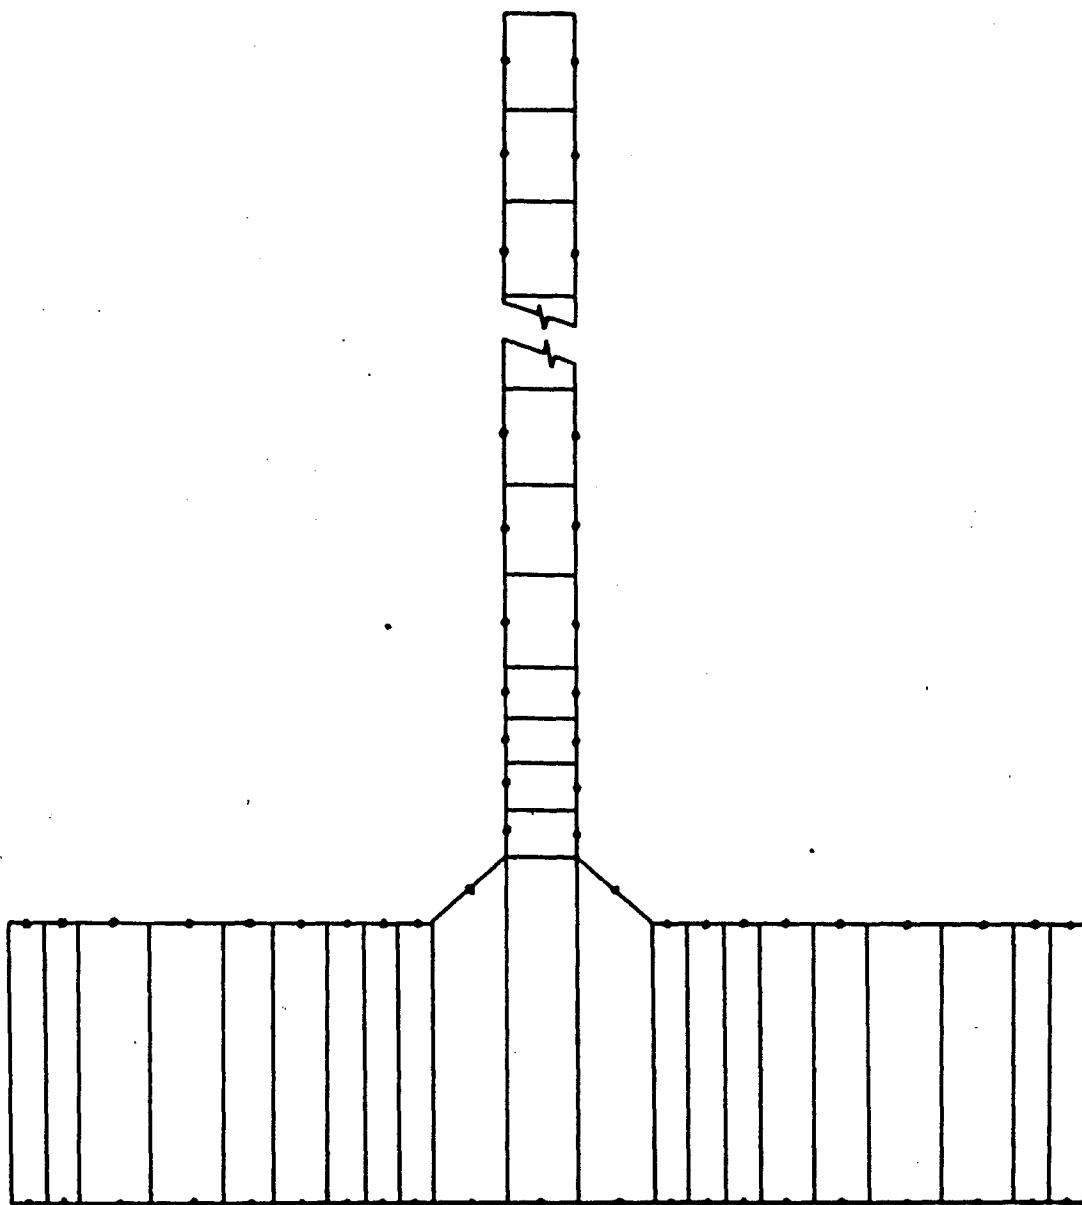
Cross-Section of Sliced Welded Beam
